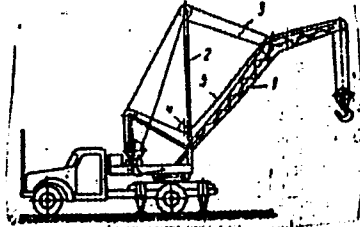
1 - boom; 2 - strut; 3 - boom pulley system; 4 - diverting pulley; 5 - load cable.
